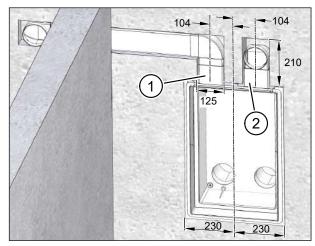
Chasing out channels for ductwork connection with flat ductwork, dimensions in millimetres
